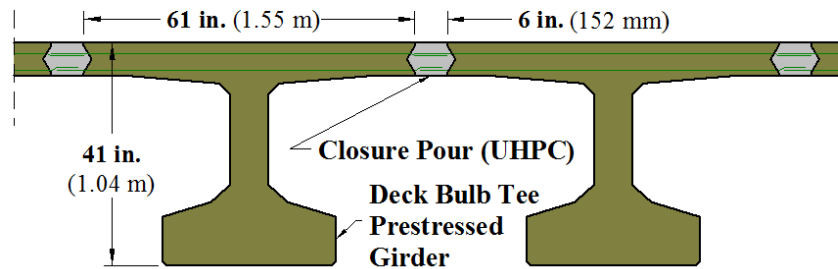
Illustration. Cross section showing CIP UHPC connection between precast beams
